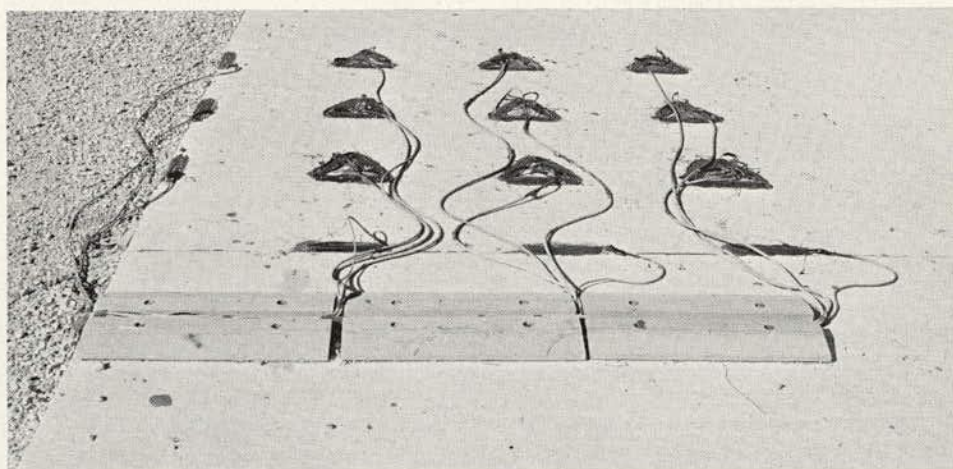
A finished installation of strain gages in Loop 1. There were 18 installations of this type. Ramp protected cables from truck-mounted vibrating loader.
